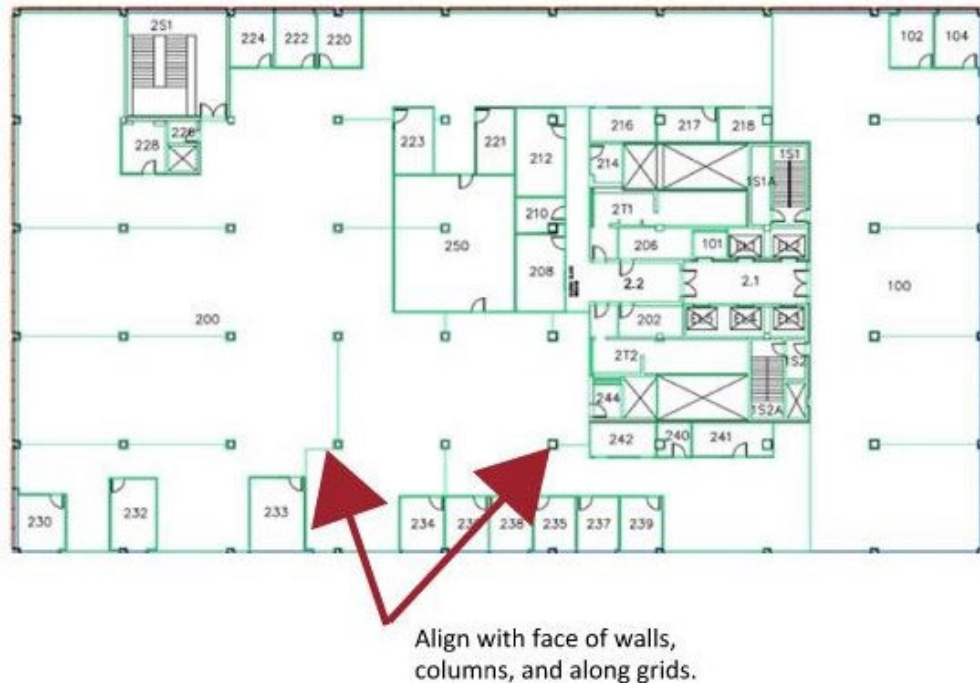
Dividing Open Spaces in Labs: Floorplan showing the division of open spaces between labs where multiple labs are operated within a larger space. In this visual, the room number division aligns with a wall. Since the wall is not continuous, the room number divider, extends through the walkway, to the next wall.
